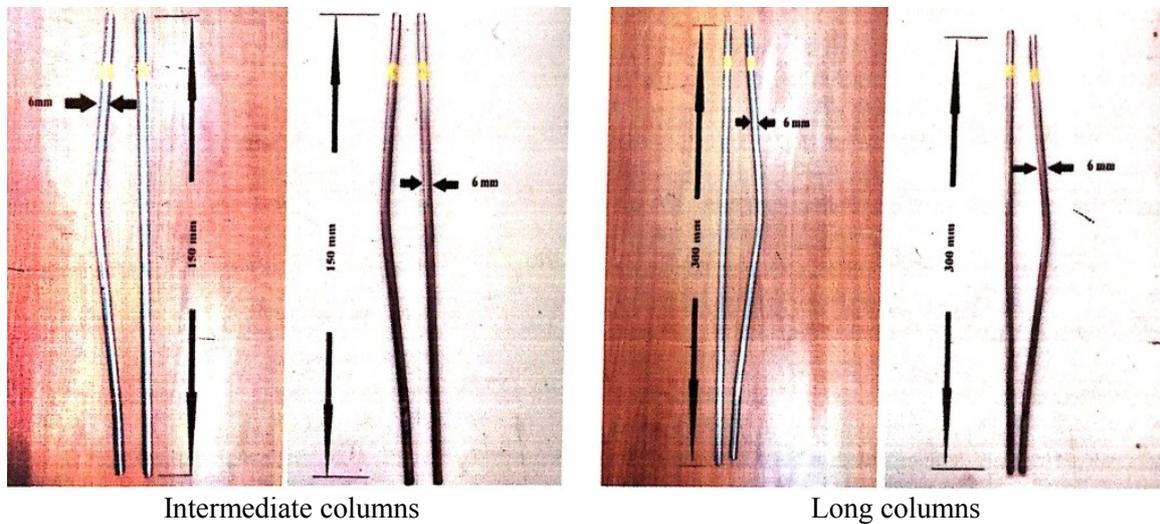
Buckling column specimens of AISI 304 stainless steel.
